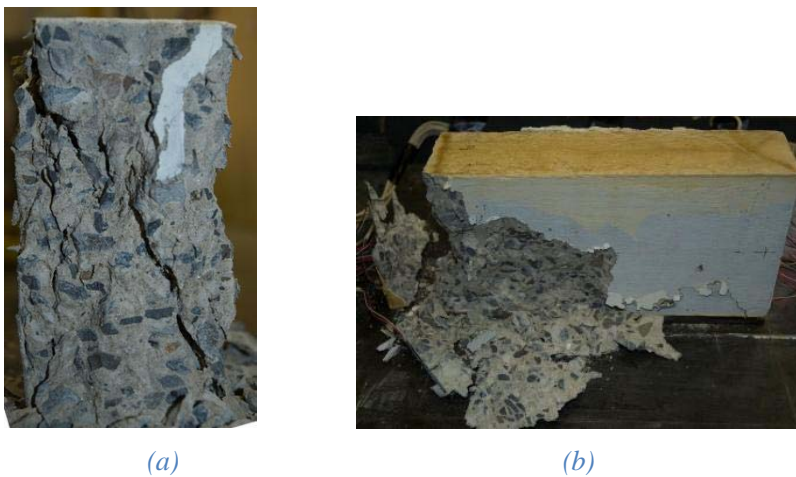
Failure pattern of concrete prism Test8-75; (a) front view; (b) side view
